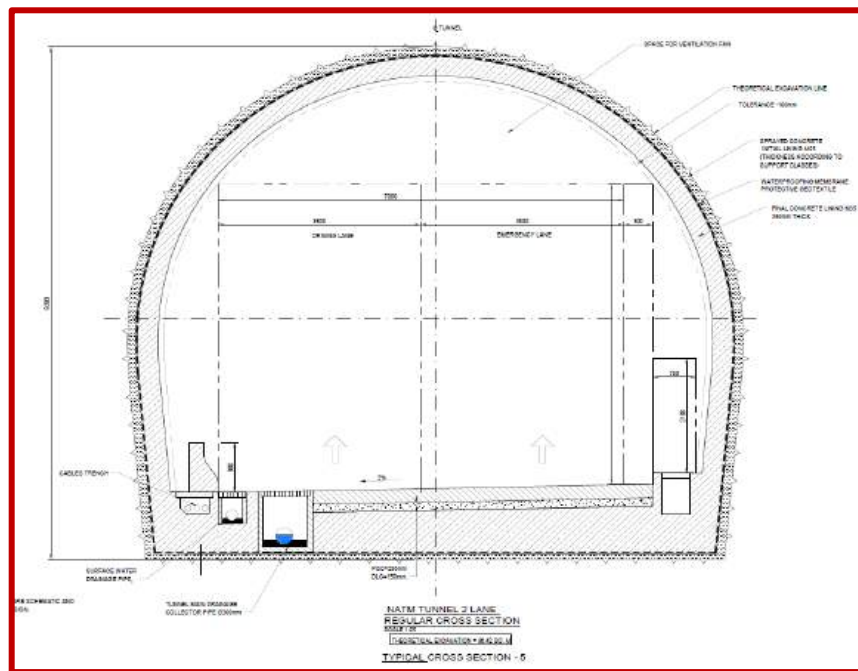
TCS-5, 2 lane NATM Tunnel Section
